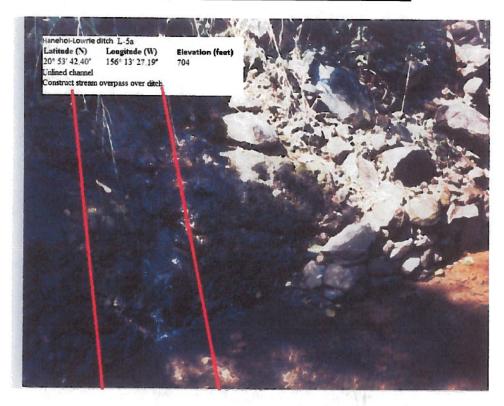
(above): East Hanehoi at Lowrie Ditch (L-5a)
